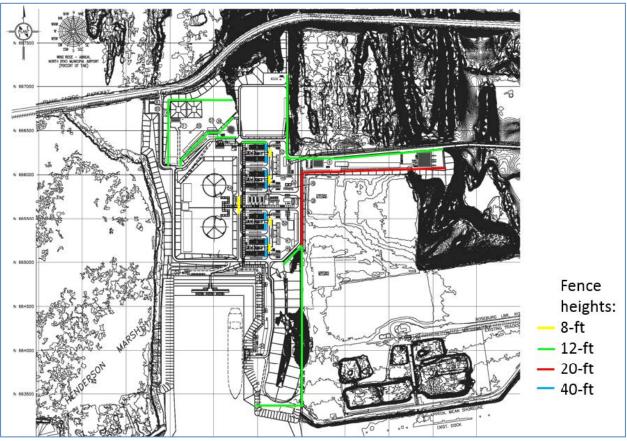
Vapor Fences at Jordan Cove Facility
